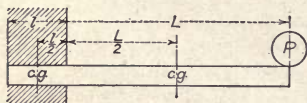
Action of Moments in Anchorage of Cantilever Beam
